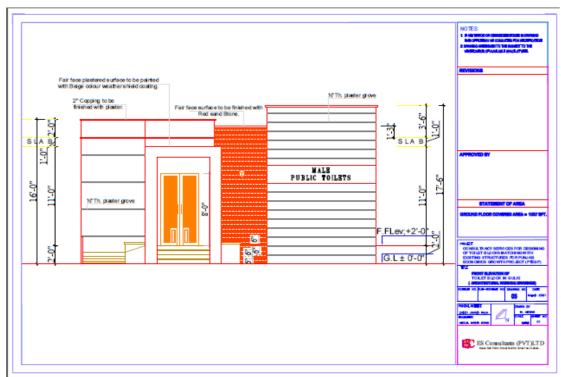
3D elevation view of the proposed toilet block at Gulki Top
